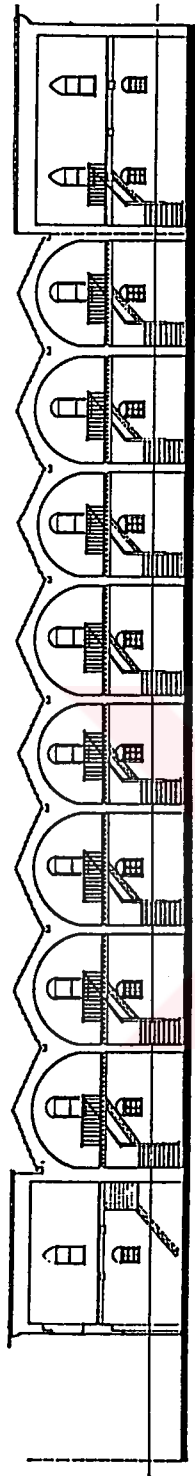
North East Wing, North East Wall. Interior (Restitution)
